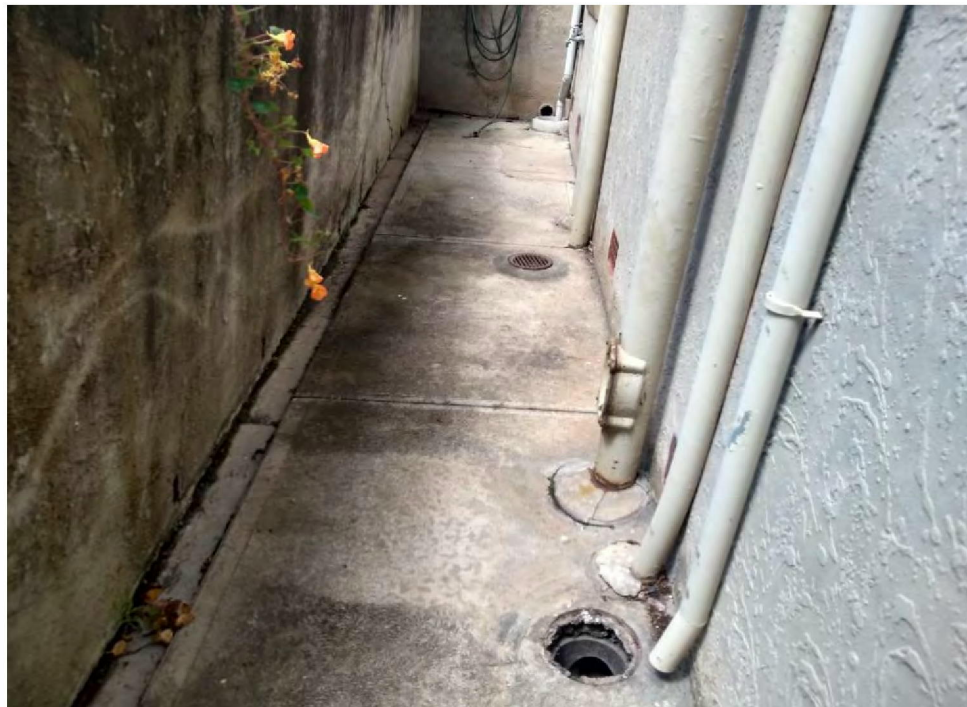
Pipes and drainage at 44 Anderson Street (SP80201)
